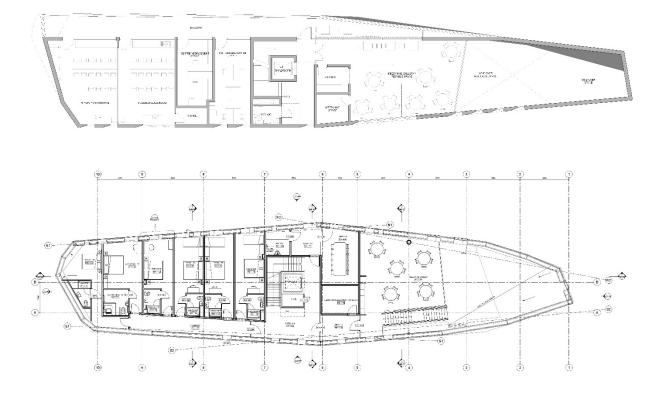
The approved First Floor layout (top) and the revised First Floor Layout (bottom) showing the incorporation of the semi-external corridor into the footprint of the building and the additional hotel-style accommodation rooms in place of the classrooms previously proposed.
